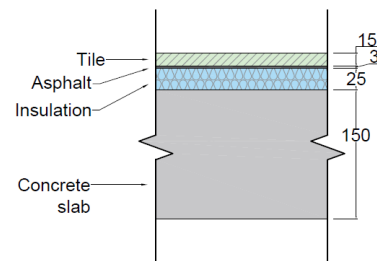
M3 roof cross-sectional detail. All dimensions are in millimetres.
